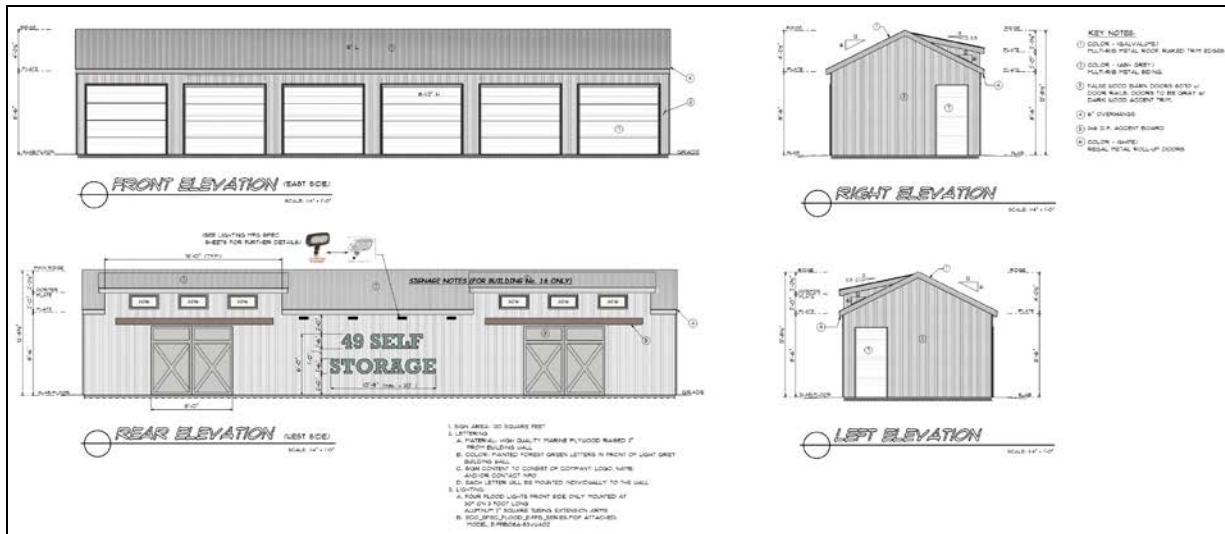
Buildings 10, 15, 16, and 17 Elevations
